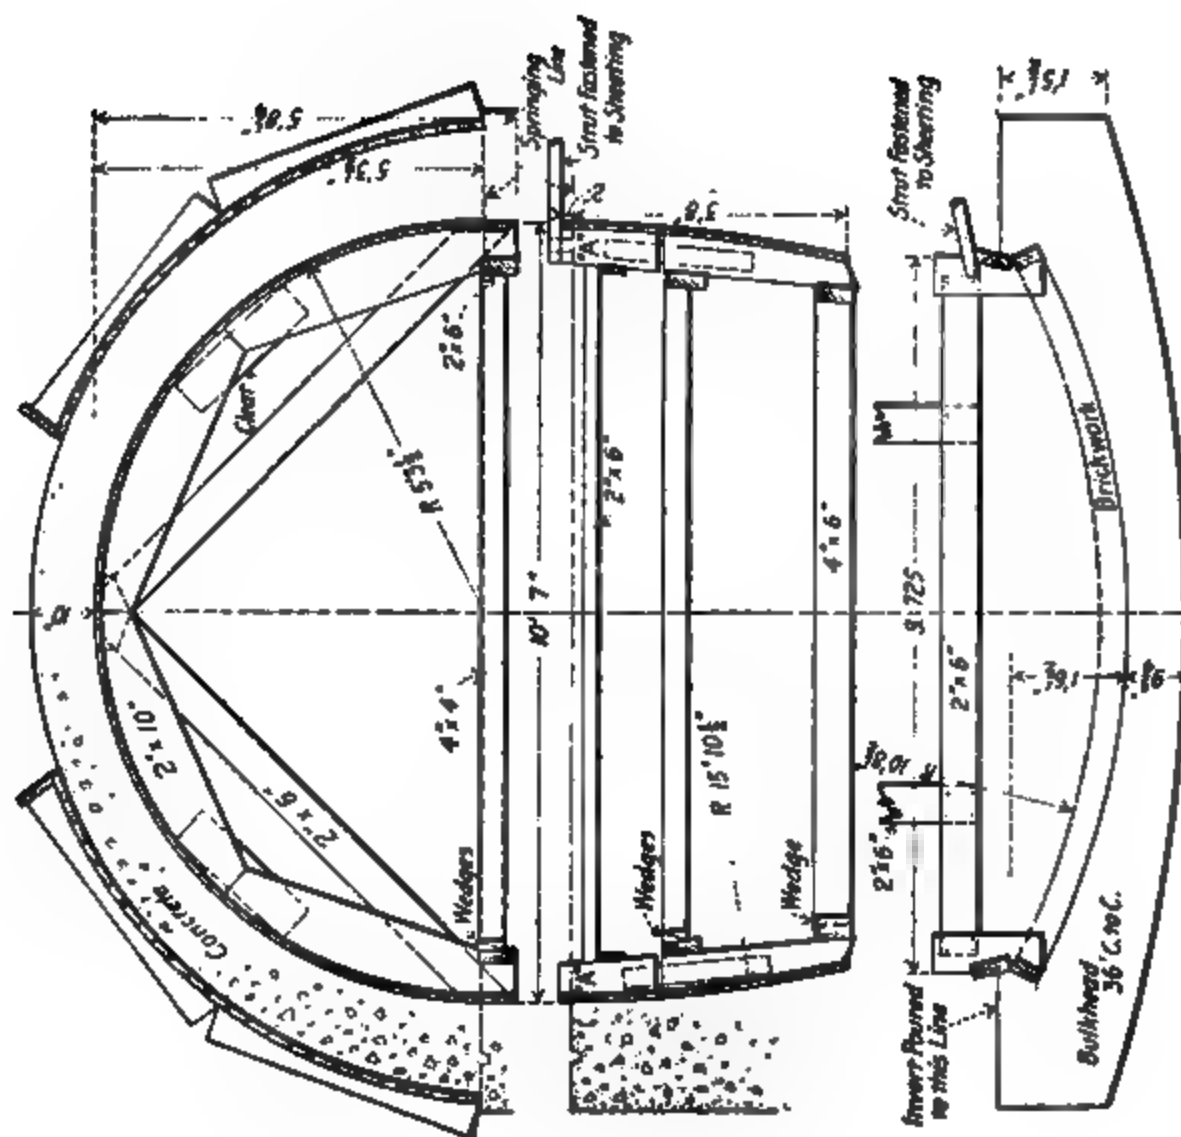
Wooden forms for large concrete sewer, Louisville, Ky.
